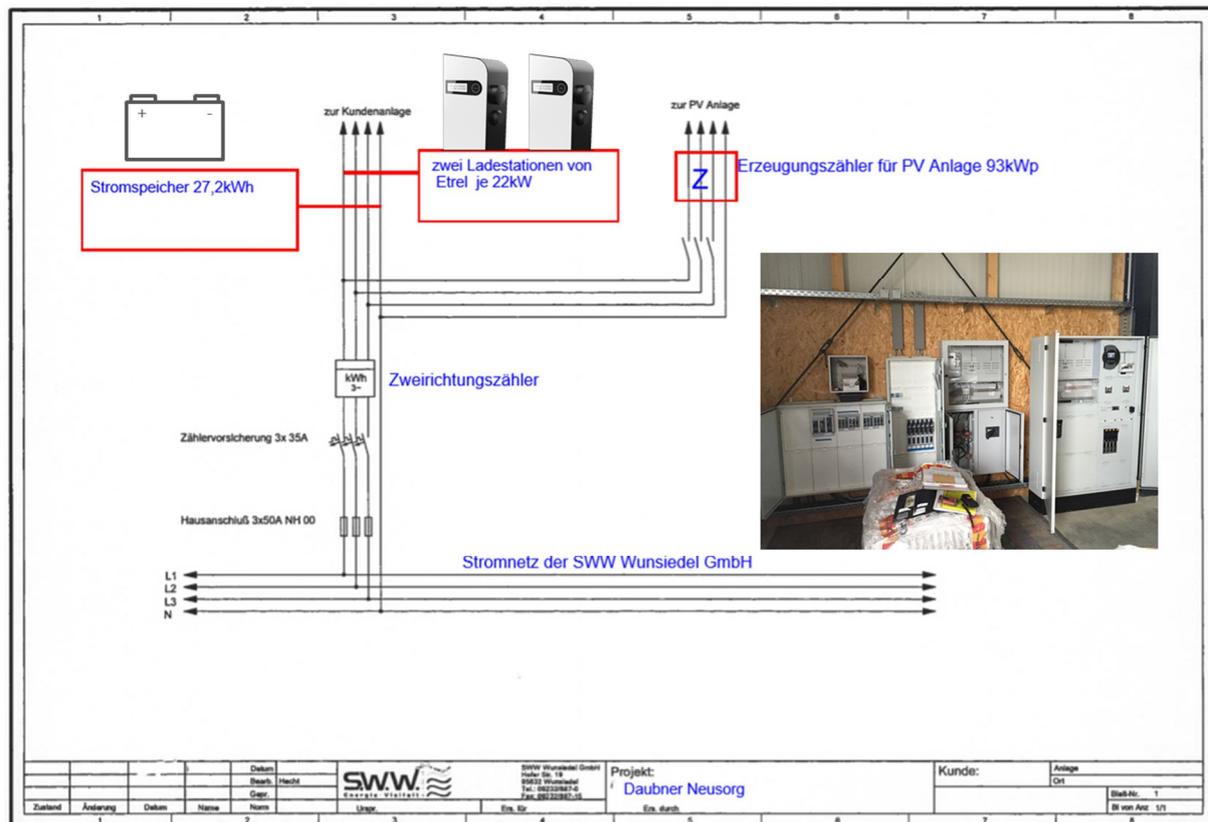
Circuit diagram – Daubner 93 kWp roof-top solar power plant with 27.2 kWh electrical storage and two 22kW ETREL charging stations ②.
